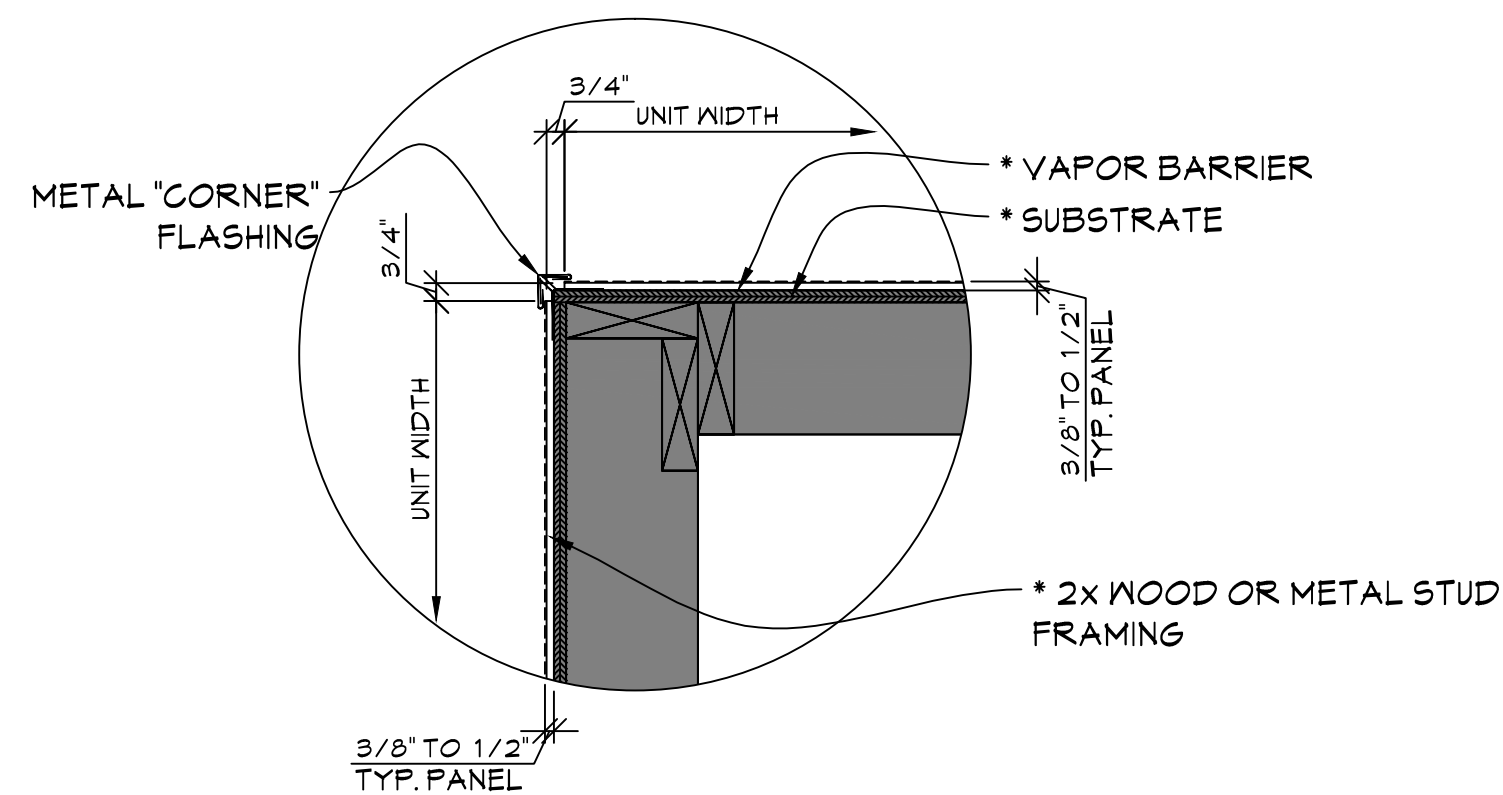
DETAIL SECTION - EnduraWal Hardcoat System (Renovation)
